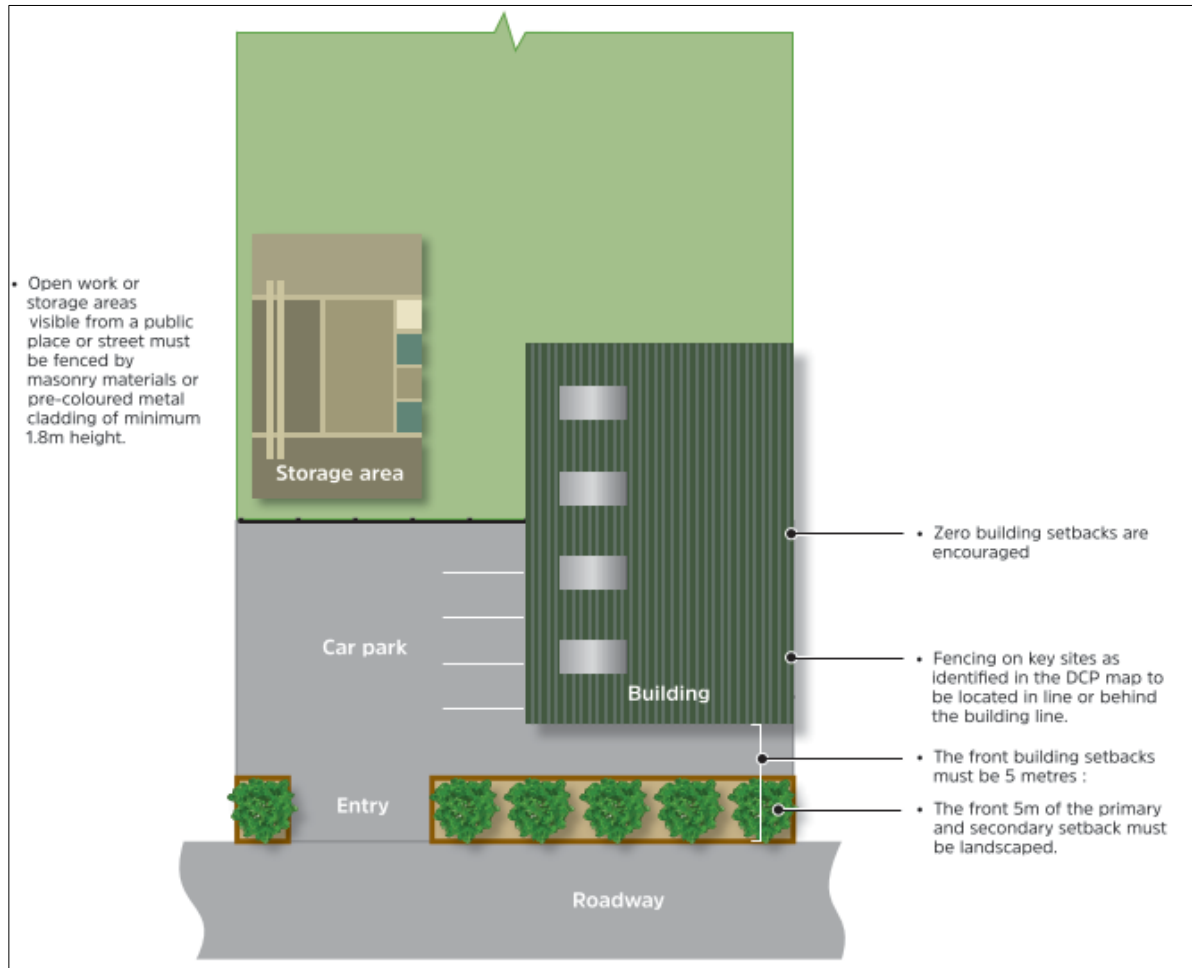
Typical Site Layout - Ring Road and Goddard Lane Sites only
